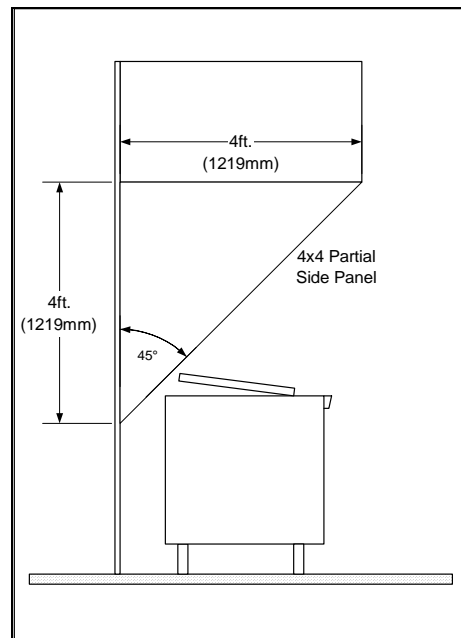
Line Drawing of 4x4x45° Partial Side Panels Installed on Canopy Hood
